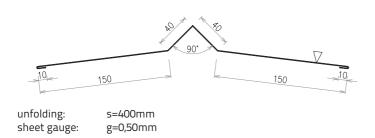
Ob-02 flashing "Roof ridge - trapezoid"
